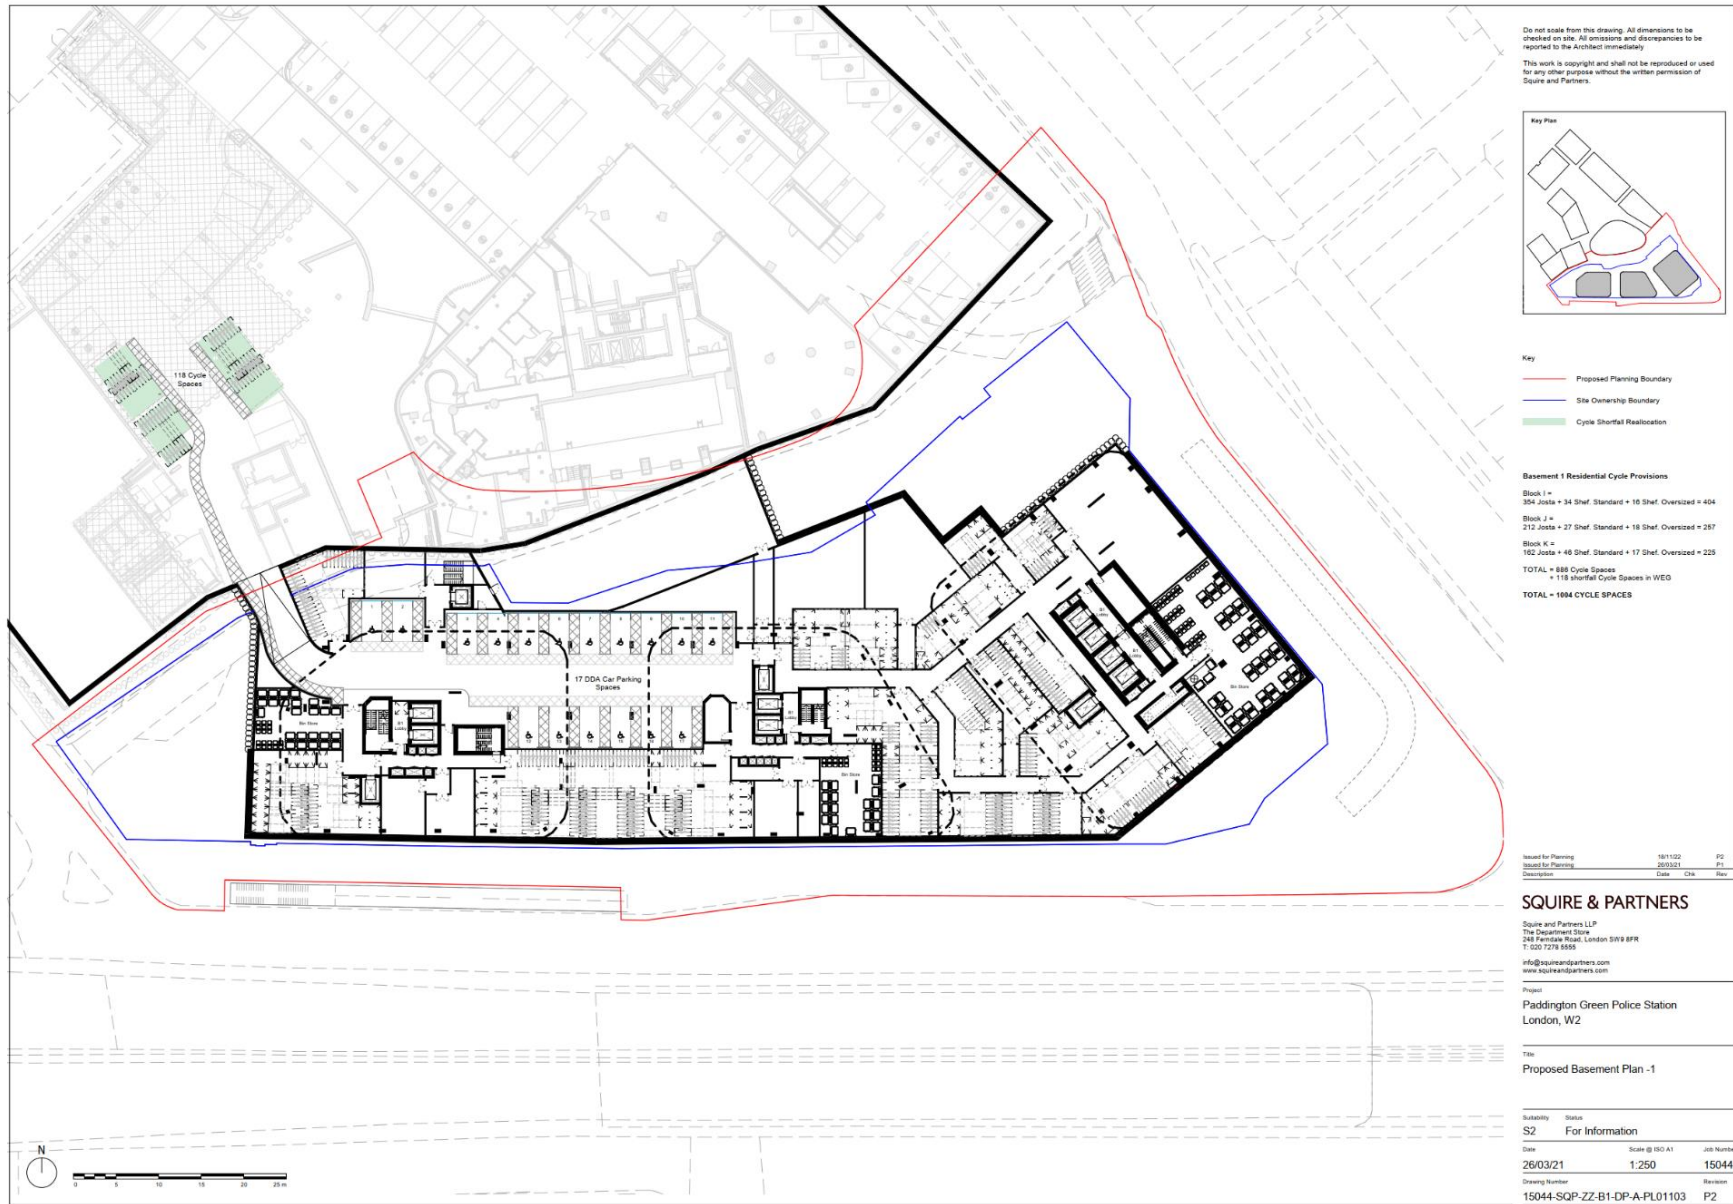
2022 Amended Proposed Development Basement Level 1 Plan
